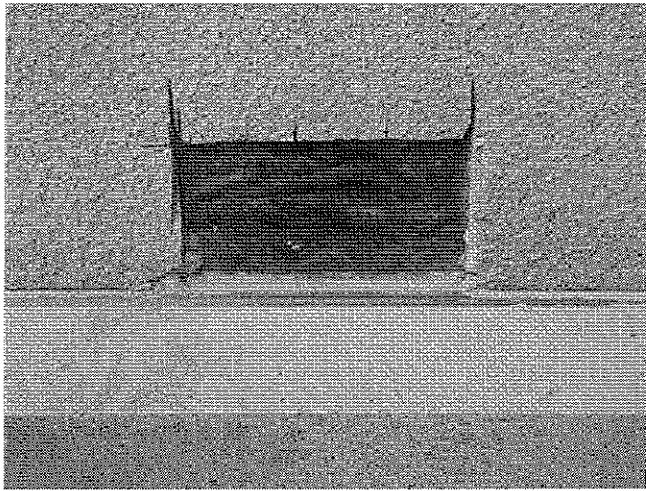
/ Front elevation cement stucco termination at horizontal lime stone cap.
